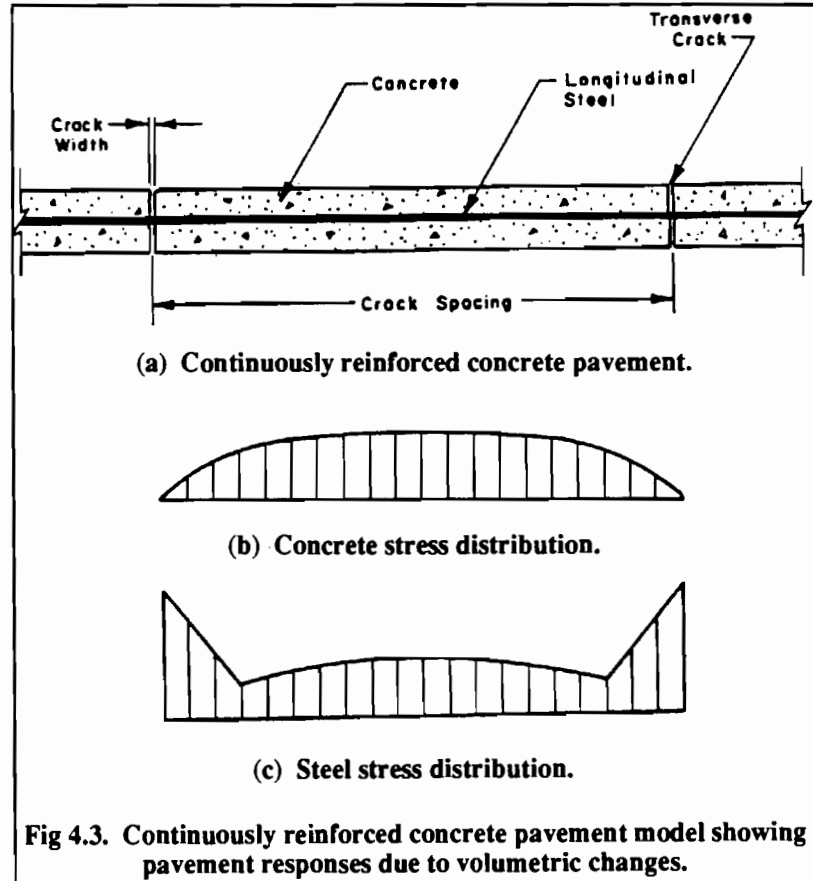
Continuously reinforced concrete pavement model showing pavement responses due to volumetric changes.
